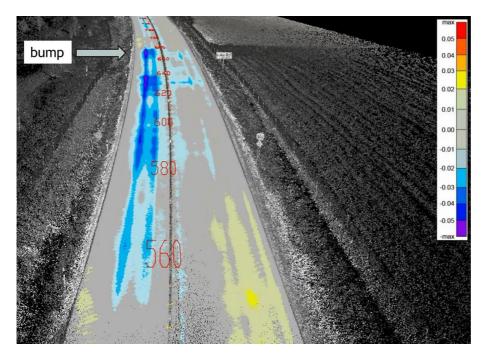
An example from laser scanner point cloud video from Sweden showing a long section with high rutting after a single bump on the road. The bump causes impact loads to the pavement due to the suspension system of trucks, which leads to faster deterioration of the pavement.
